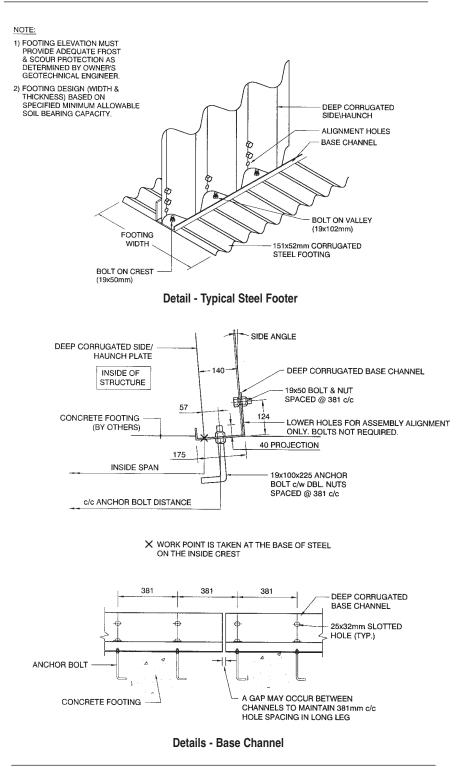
Additional details for deep corrugated structural plate Type I.
